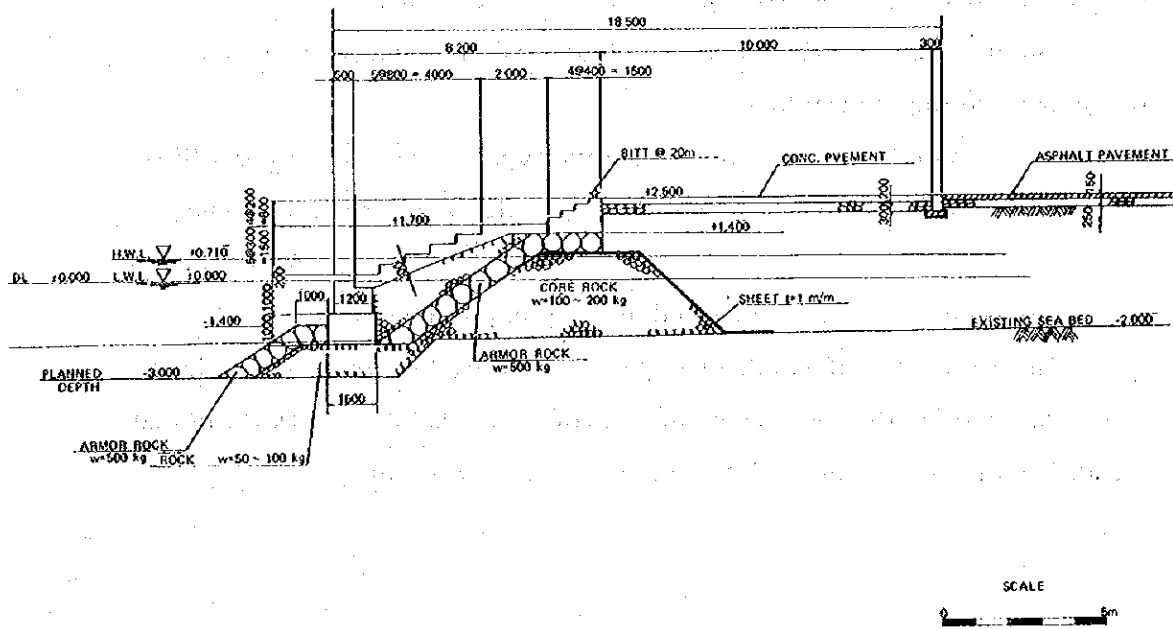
Cross Section of Stair Landing – Sual Port
